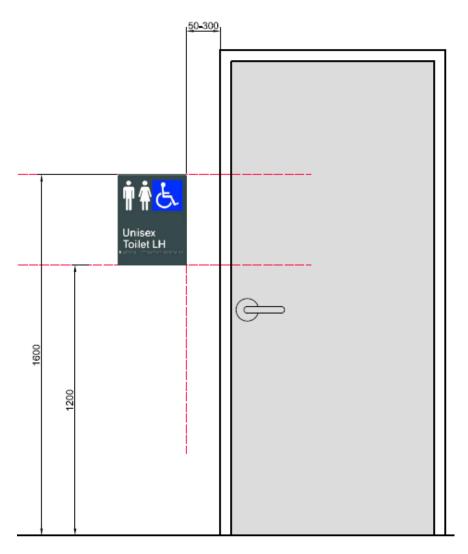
Elevation setout of Braille Tactile signs adjacent to doors
